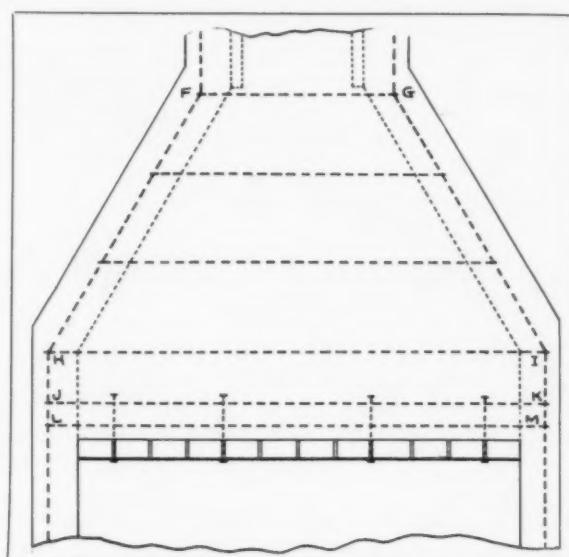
Reinforcing of Chimney Throat Above the Fireplace
